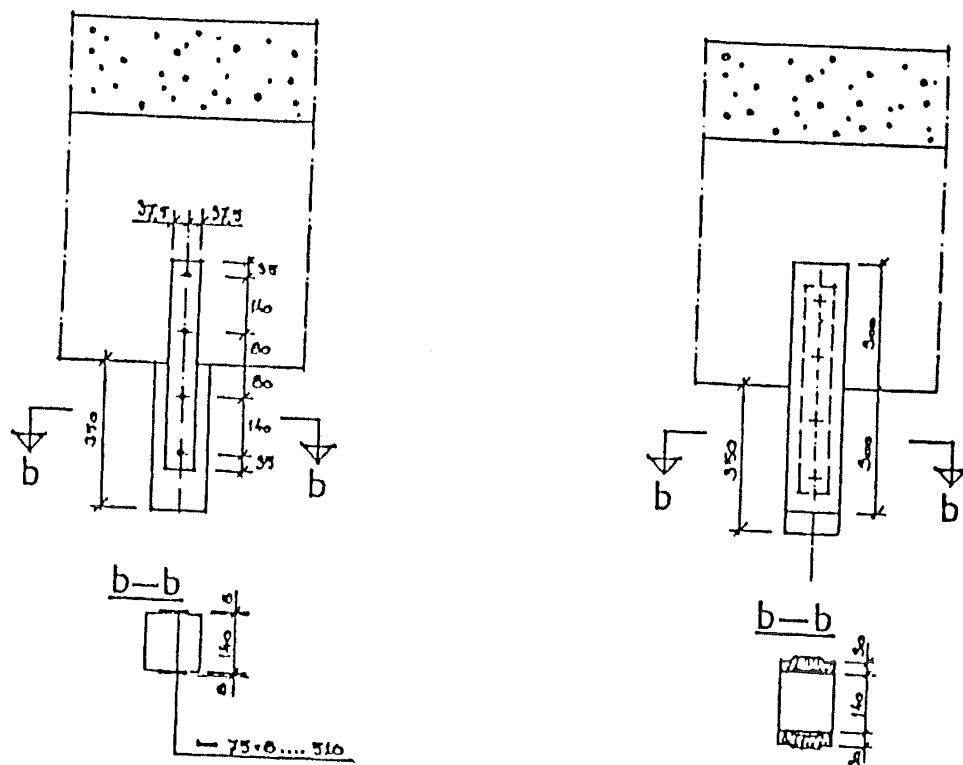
Fire tested beam-to-column connections of steel gussets and screws with or without mineral wool insulation.
